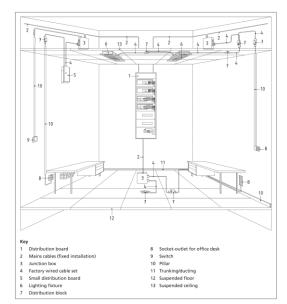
Diagrammatic Presentation of a Typical Prefabricated Wiring System
